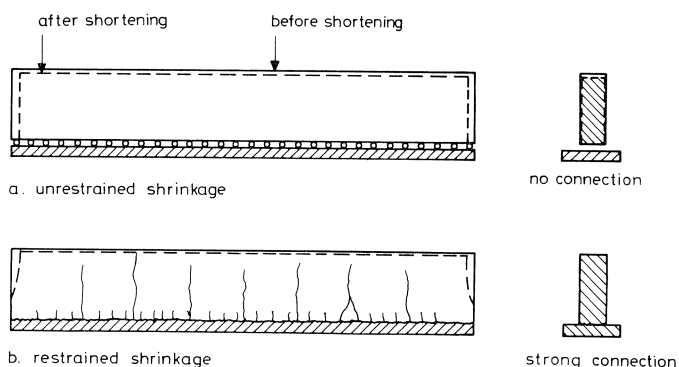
Cracking due to restrained shrinkage in a wall concreted onto a floor that had already hardened.
